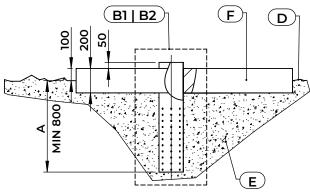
ADAPT MAX 10035 foundation – Underground pipe connection, installation with antifreeze valves
